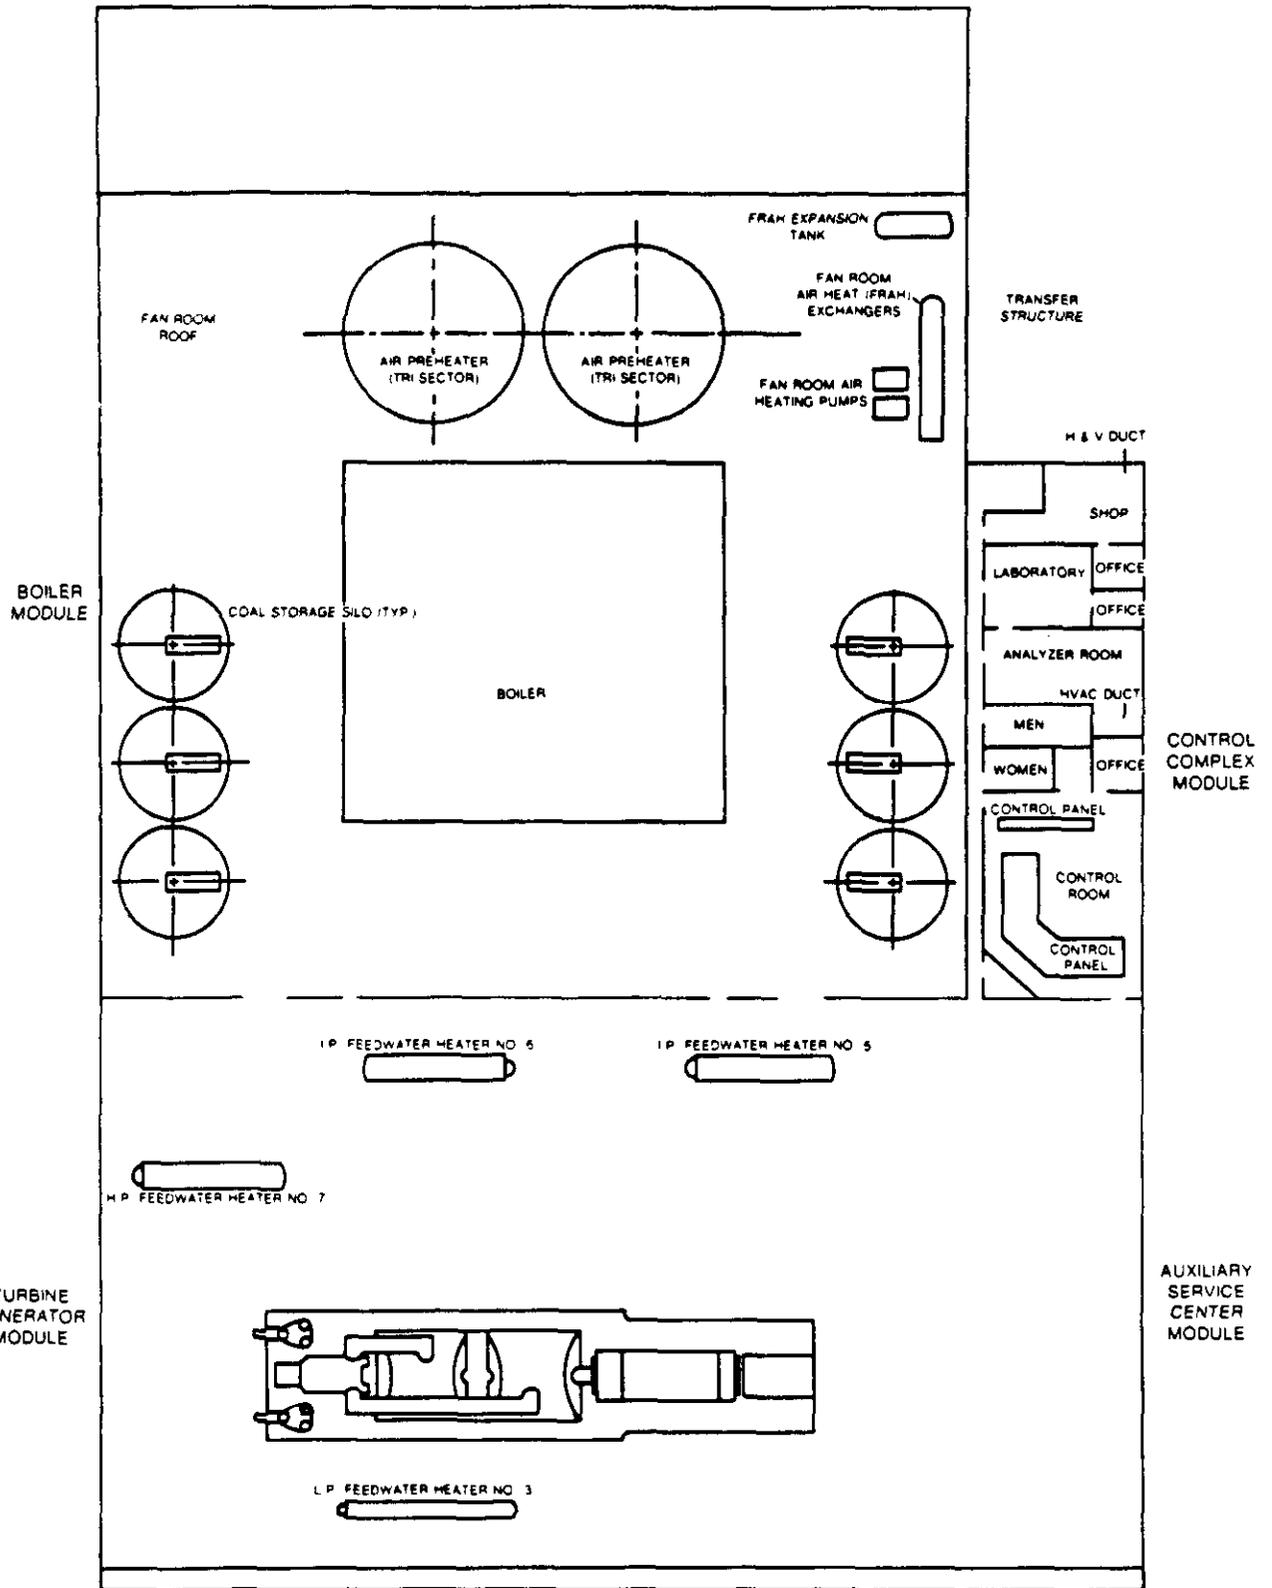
500 MWe Reference Plant Arrangement Plan Operating and Feeder Floor
